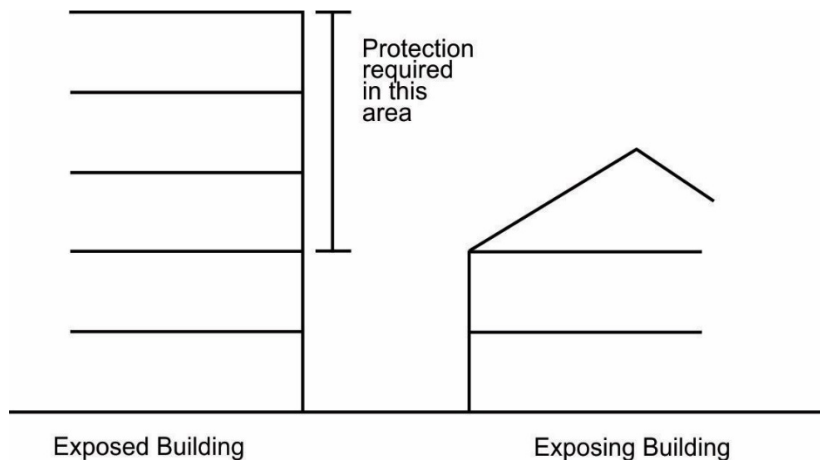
Example Of When The Exposure Protection Should Be Provided When Exposing Building Has A Lower Roof Line.
